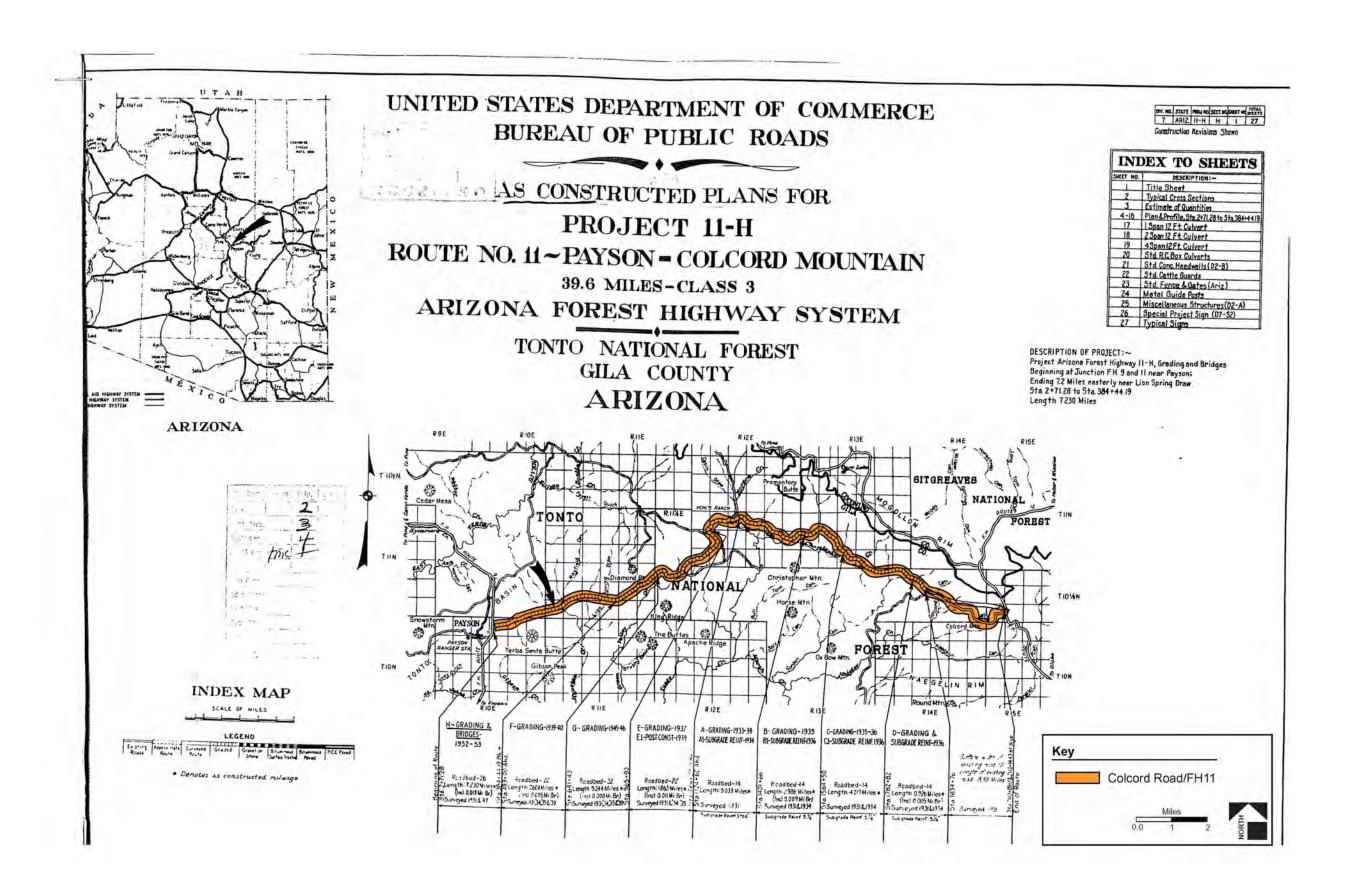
1952 Bureau of Public Roads as-built plan showing the current, in-use alignment of the Colcord Road.
